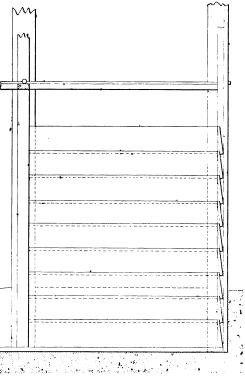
Partial Section on Line A B of Plan, Showing Arrangement of Wall Framing.
